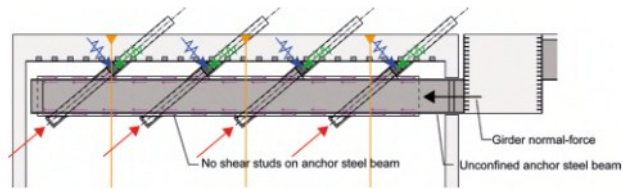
Girder axial force transferred to composite anchor beam purely by bonding as no shear studs were provided
